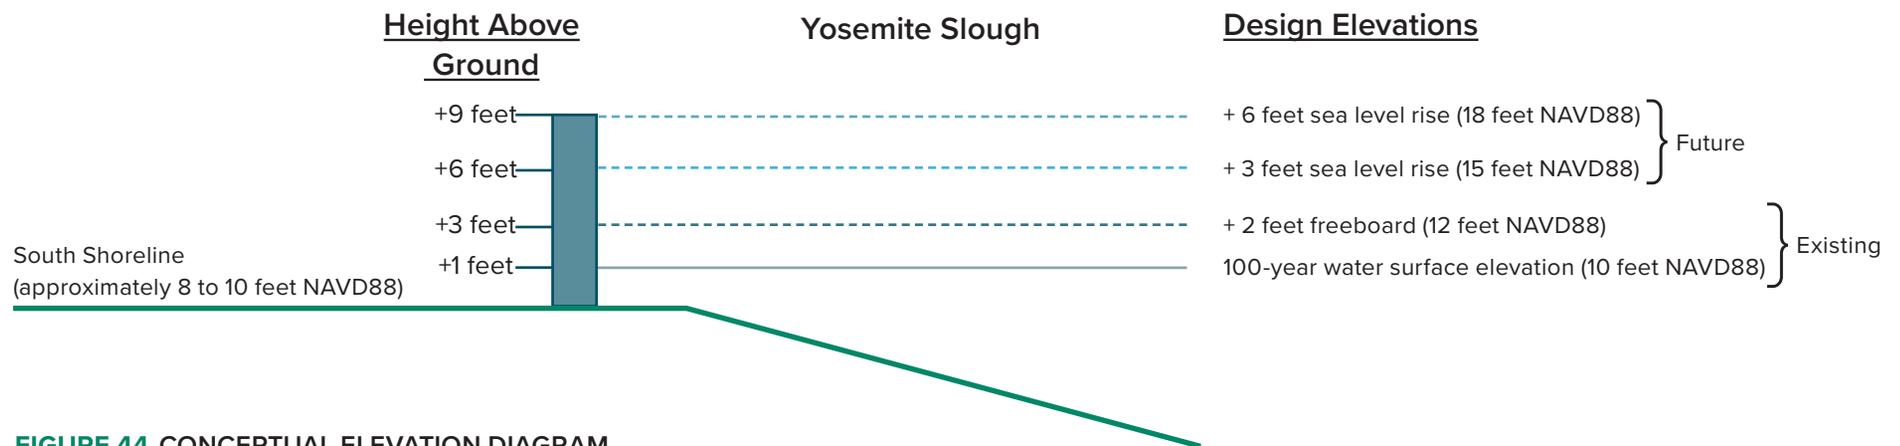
CONCEPTUAL ELEVATION DIAGRAM
